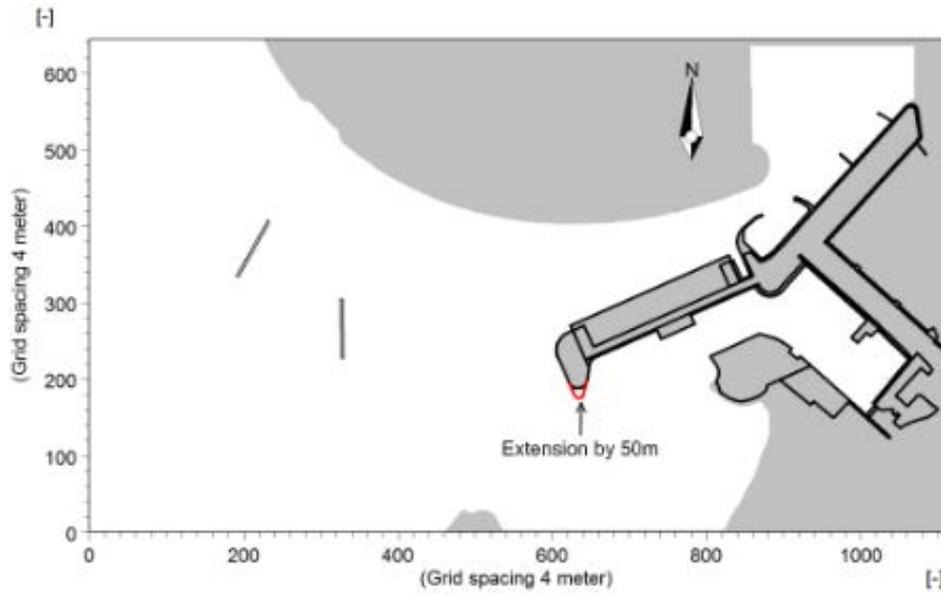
Alternative lighthouse platform layout (shown in red)
